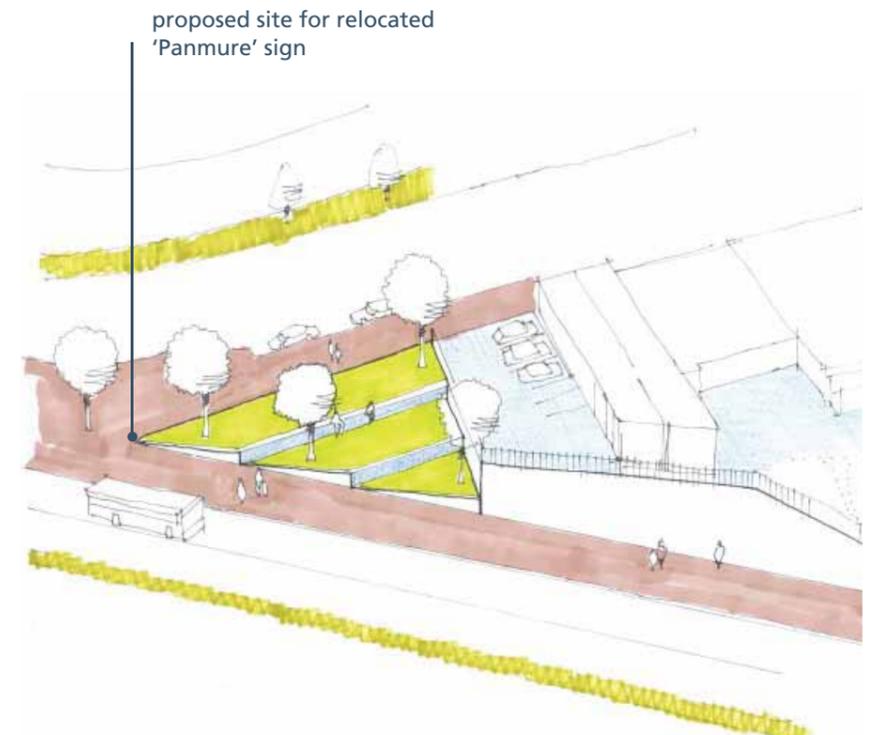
Panmure Roundabout & Lagoon Drive: key to landscape plans
